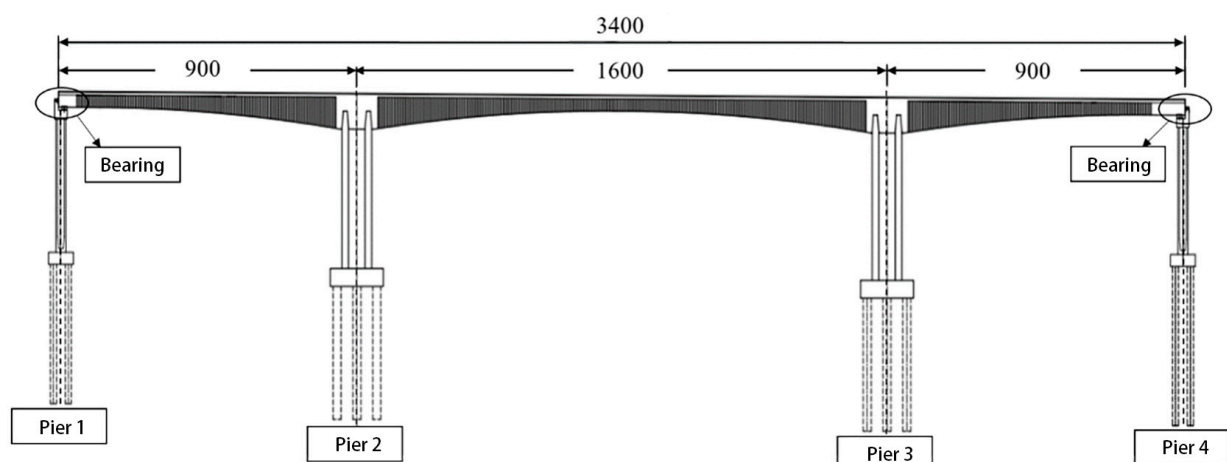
Layout of the main bridge type of Pingchuan Yellow river bridge.
